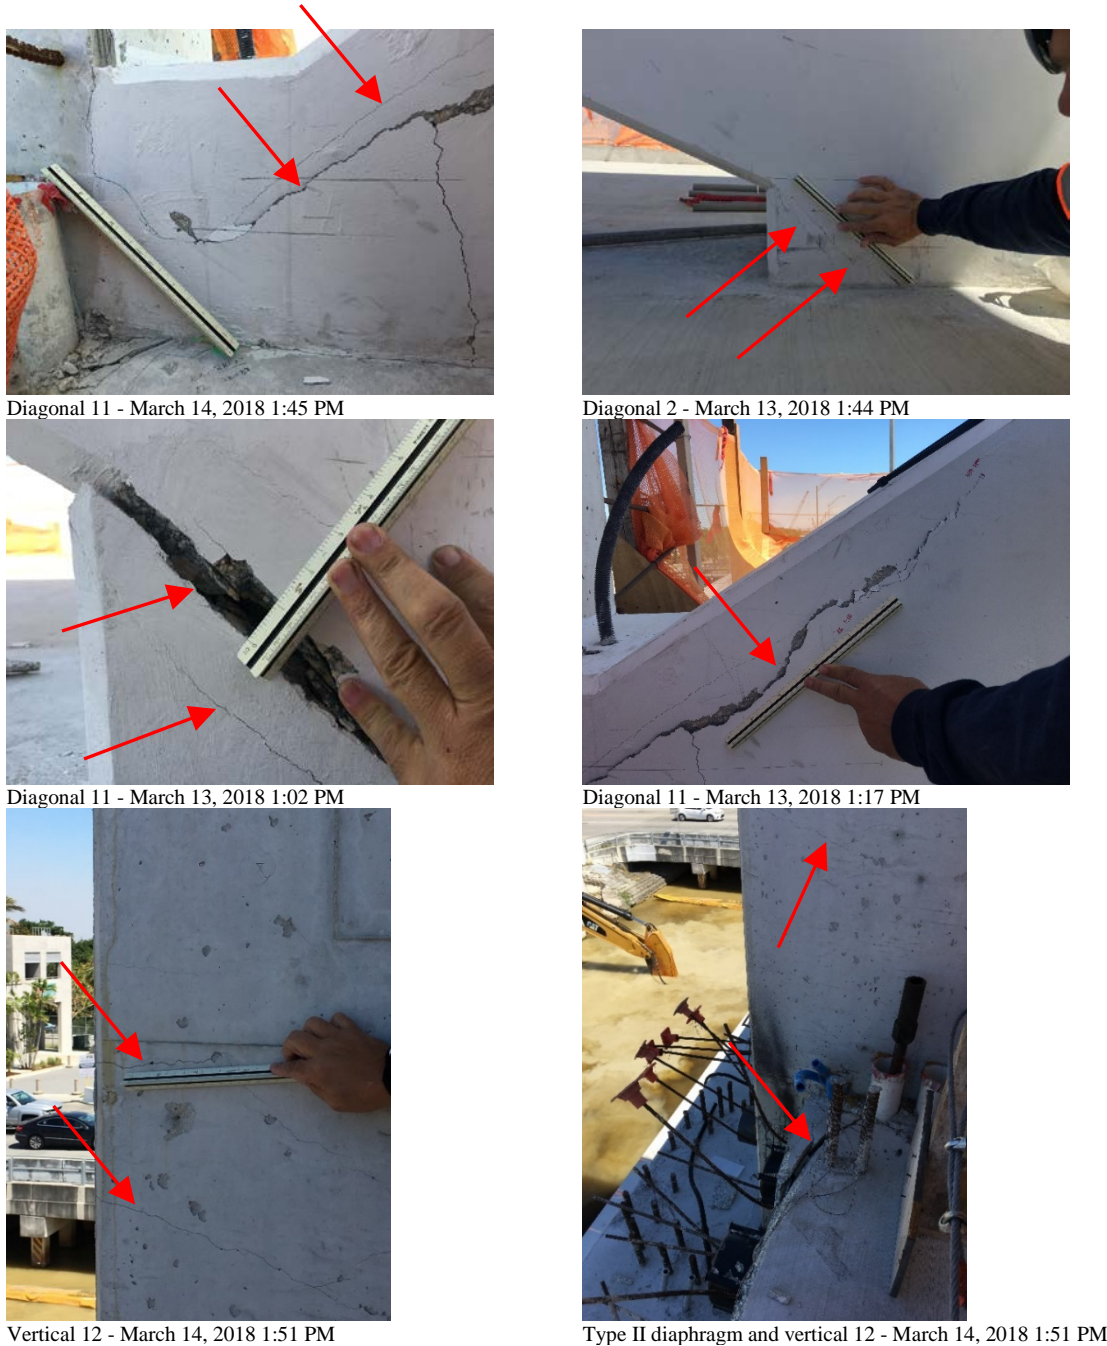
Cracks observed by BPA near bases of Truss end Members after destressing of PT in diagonal Members 2 and 11 (indicated with red arrows).¹⁵²
